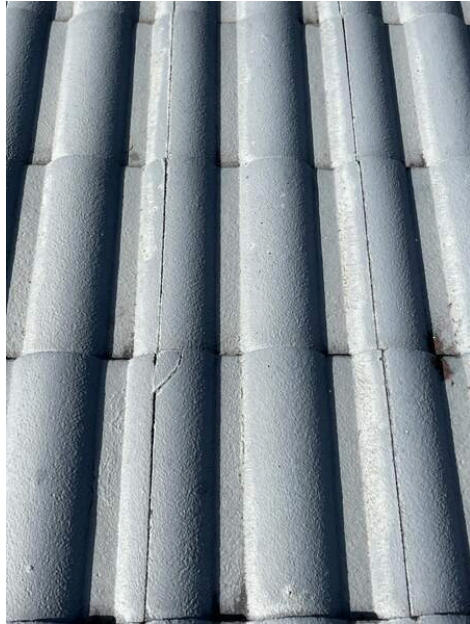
There are several tiles with cracked corners. This should be monitored for possible moisture ingress and renewed as necessary.
